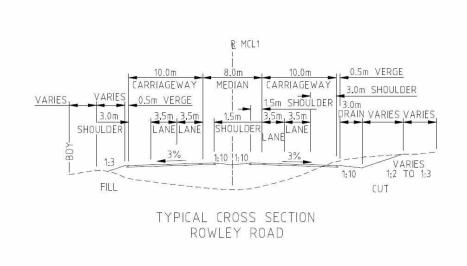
Typical Cross Section of Upgraded Rowley Road Recommended in GHD Report
